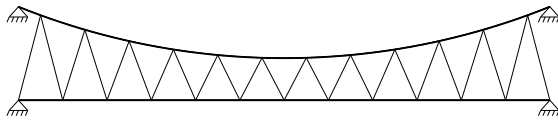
Suspension bridge stabilization by application of diagonal suspenders
